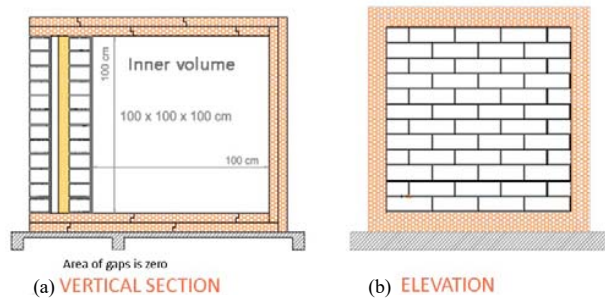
Scheme of Non-Ventilated Façade (NVF). $A_{ef} = 0 \text{ mm}^2$. (a) Vertical section and (b) elevation
